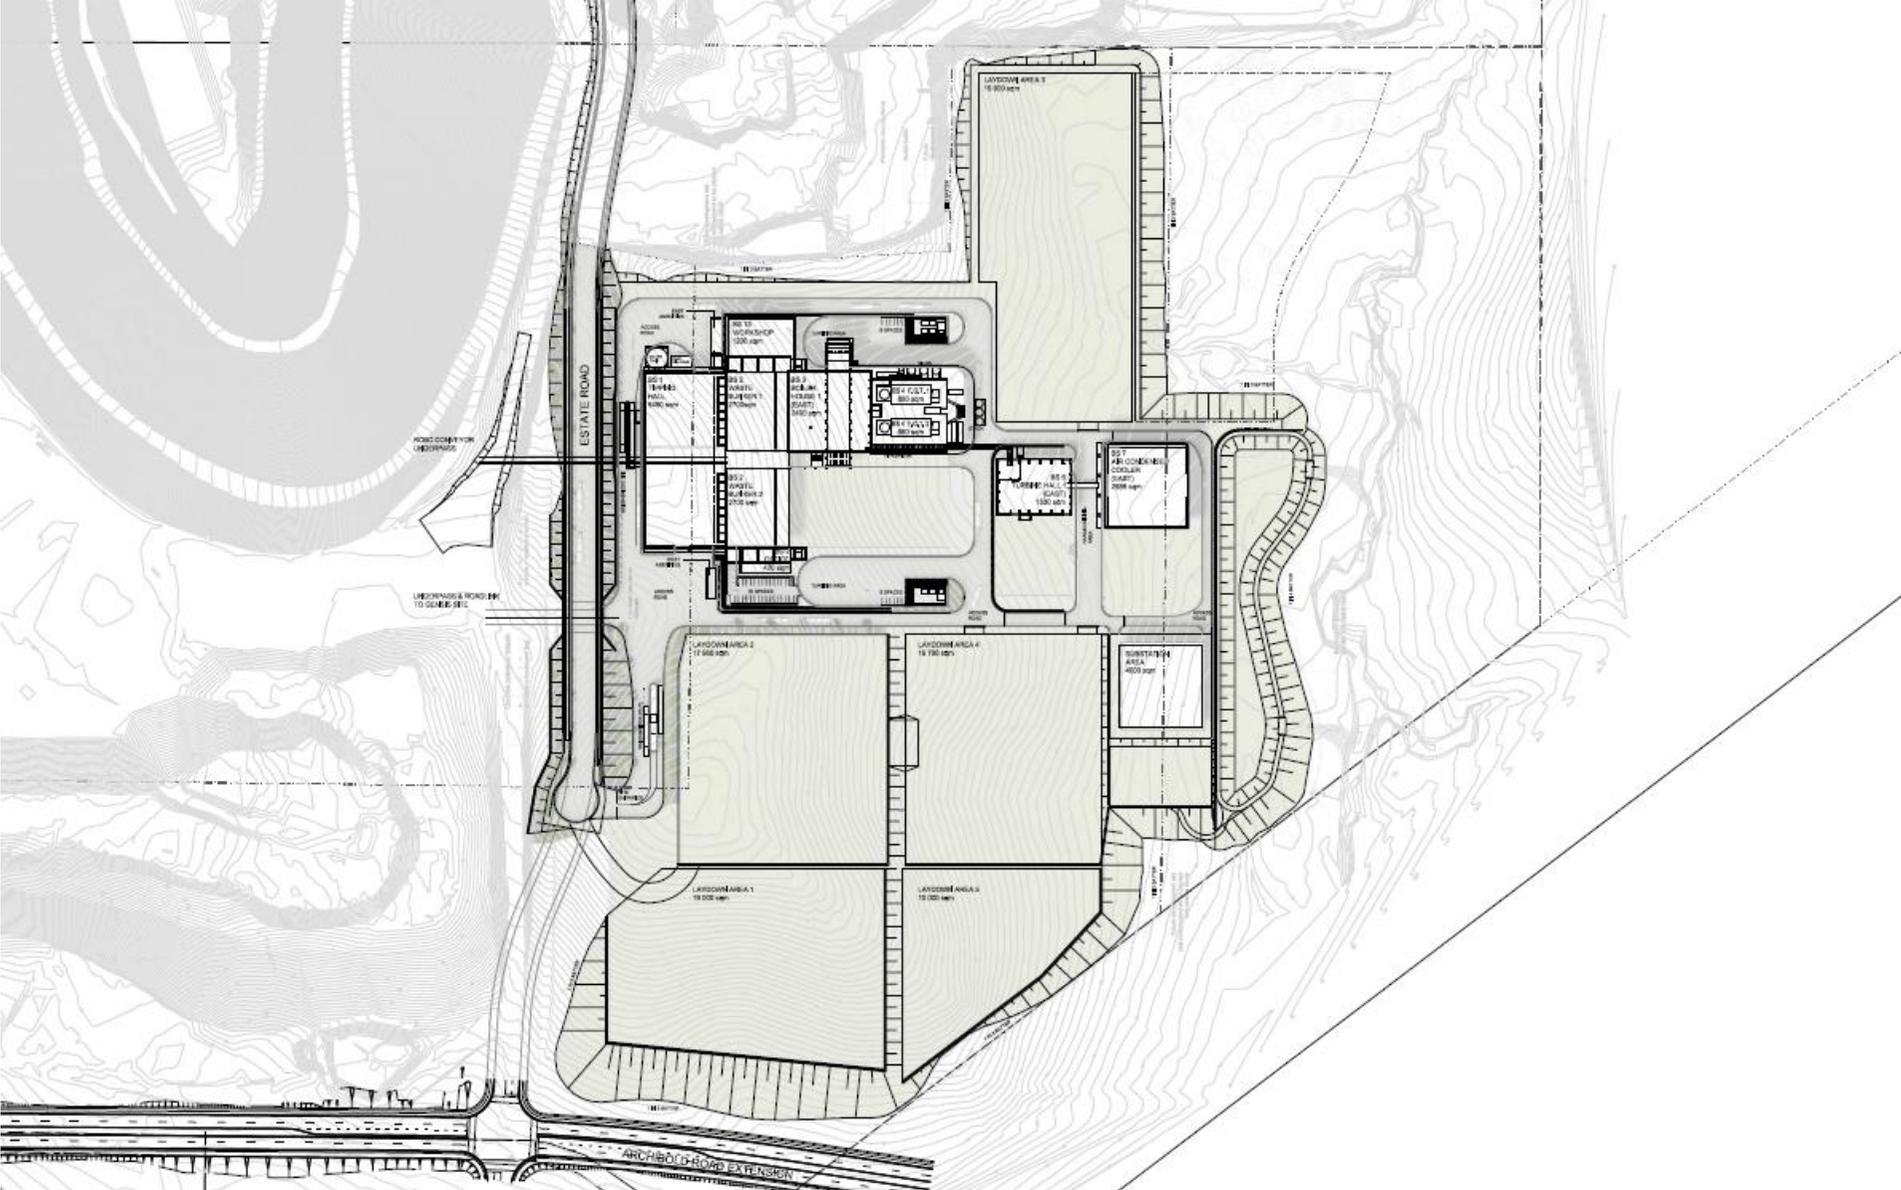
Building layout and use (source: Krikis Taylor Architects, 2017)
